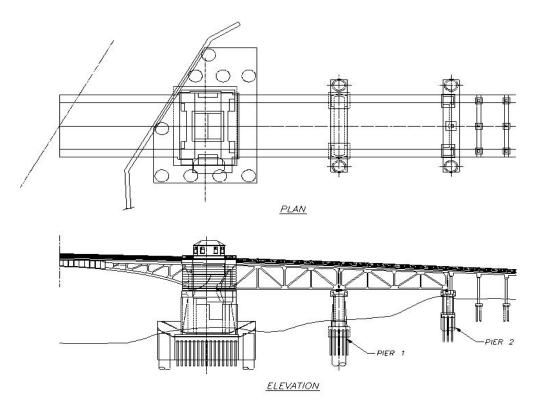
Steel Truss Approach – Rehabilitation Option 1
